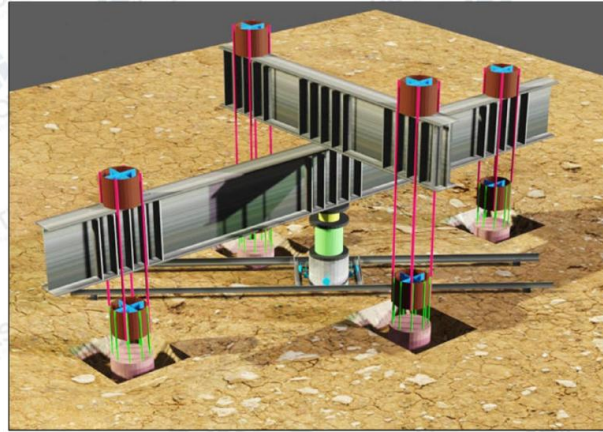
Schematic Reaction System for Axial Load Test Pressing Beam Foundation
